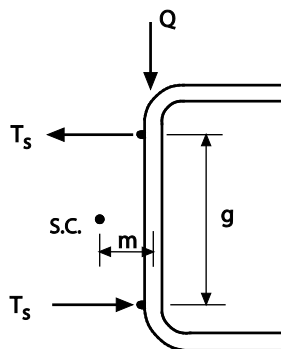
Tensile Force Developed in the Connector for C-Section
